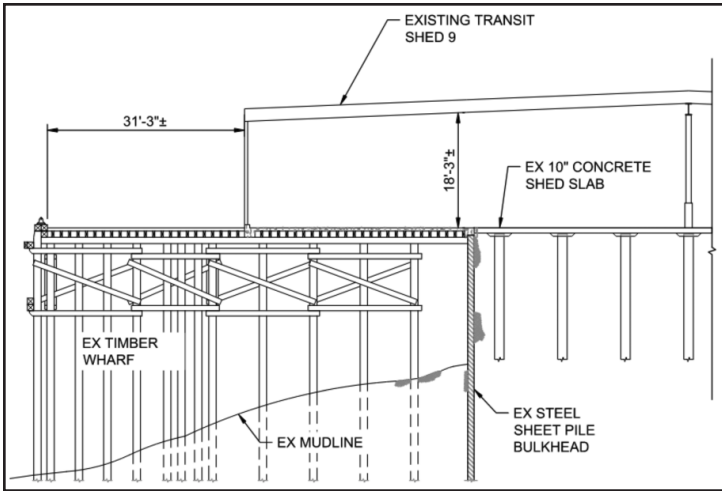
Existing cross section through Berth 9 and Transit Shed 9. Note existing bulkhead within shed footprint.
